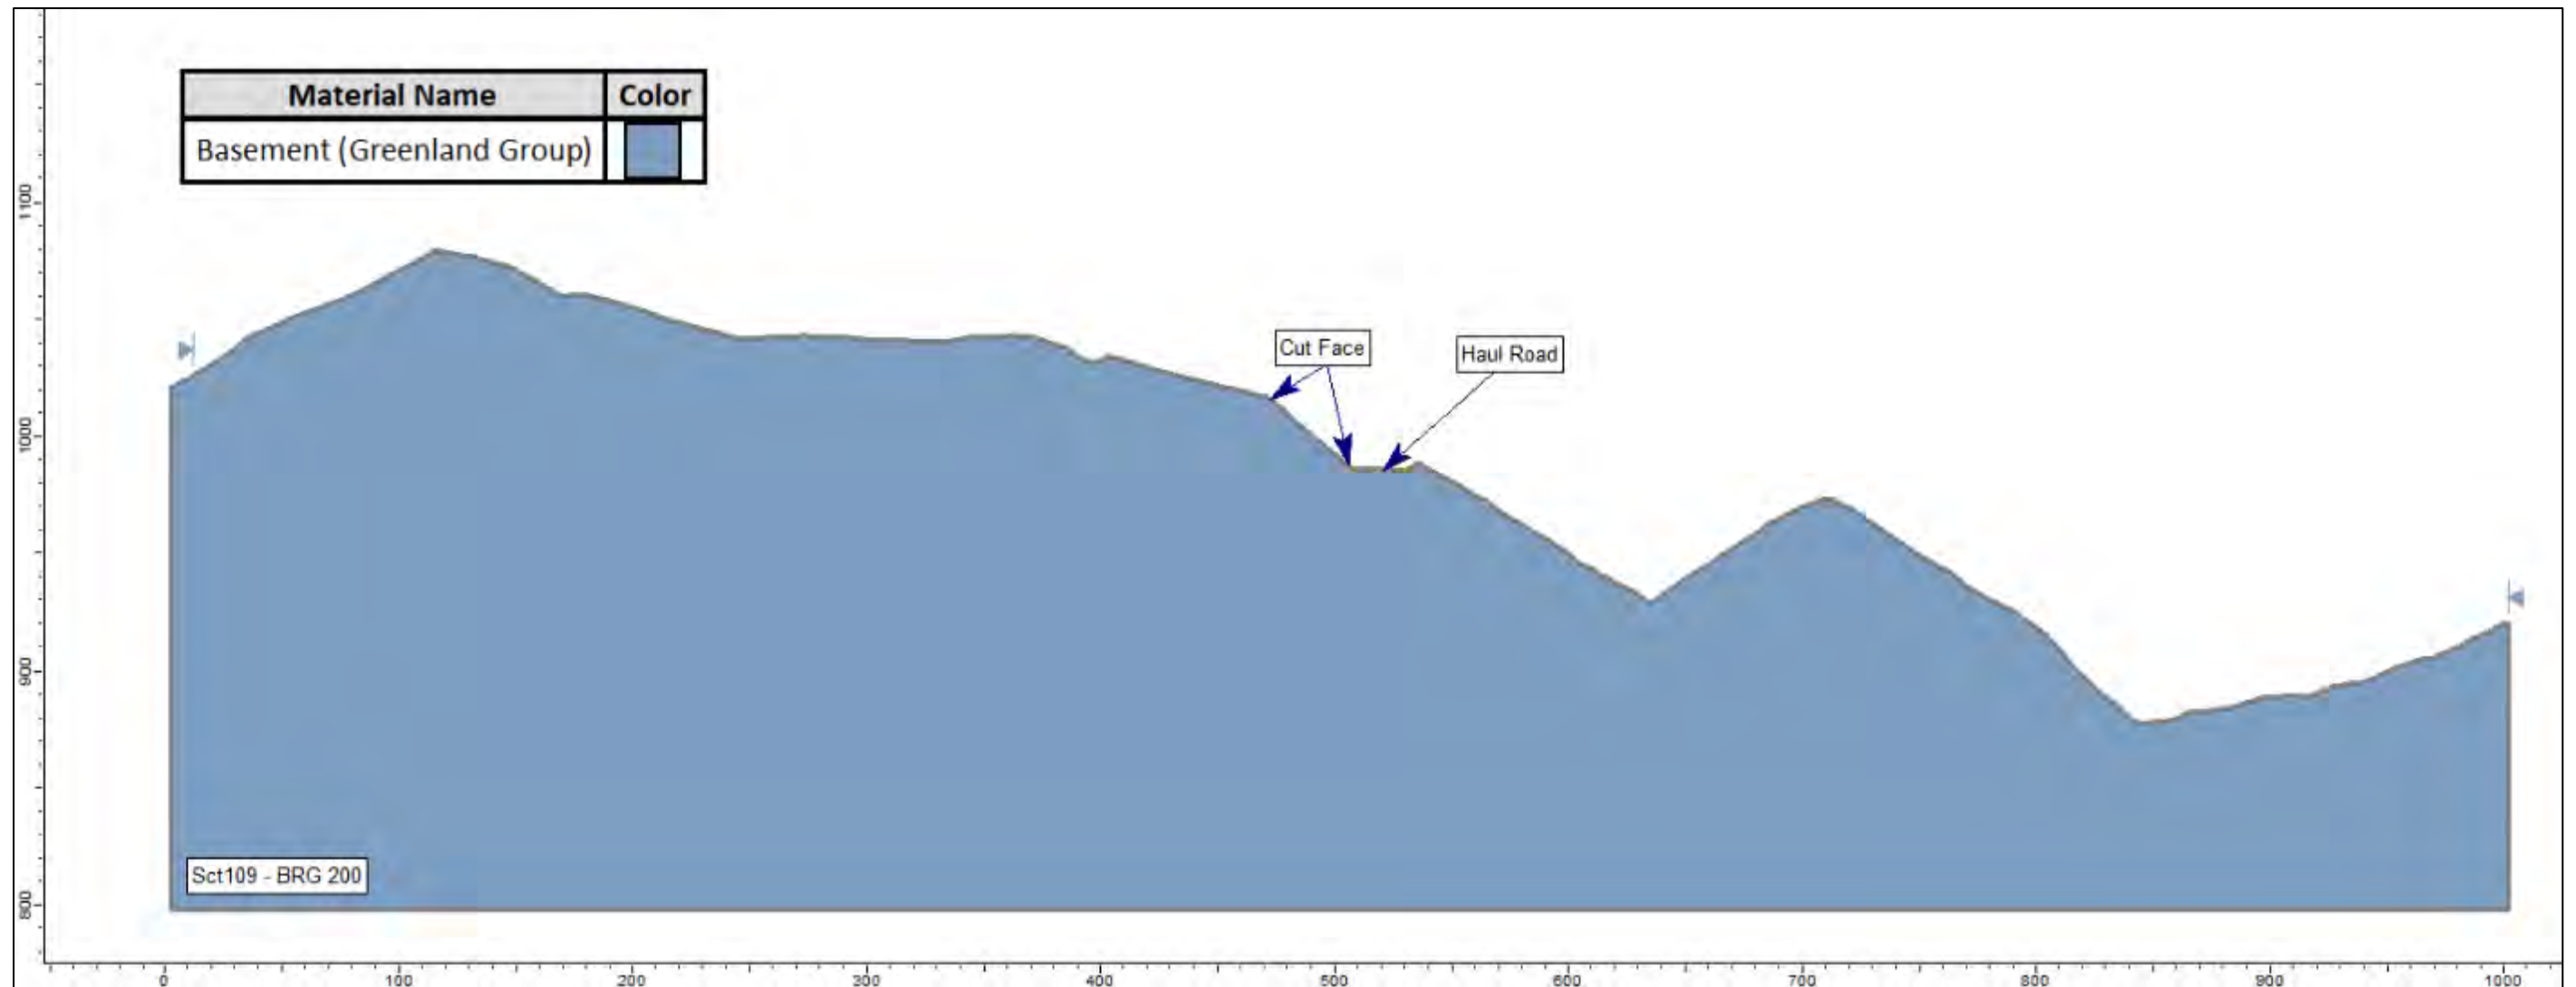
Section 109 – Haul Road Cut – Overview.
